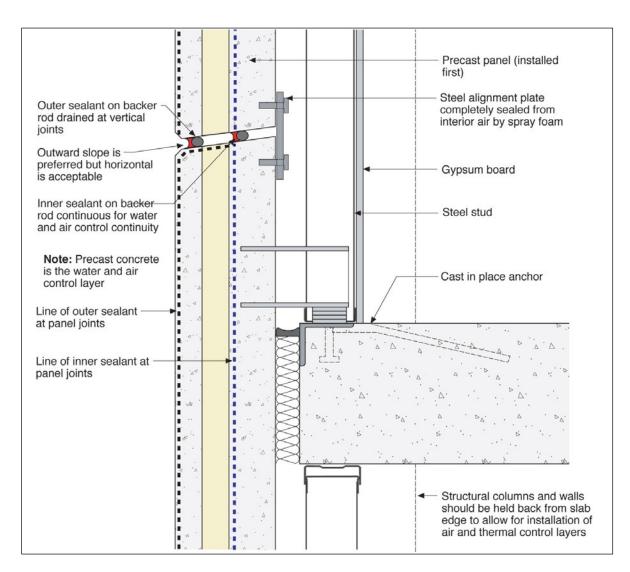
Section at floor of a high-performance double-wythe insulated precast concrete sandwich panel (CPCI 2013).
